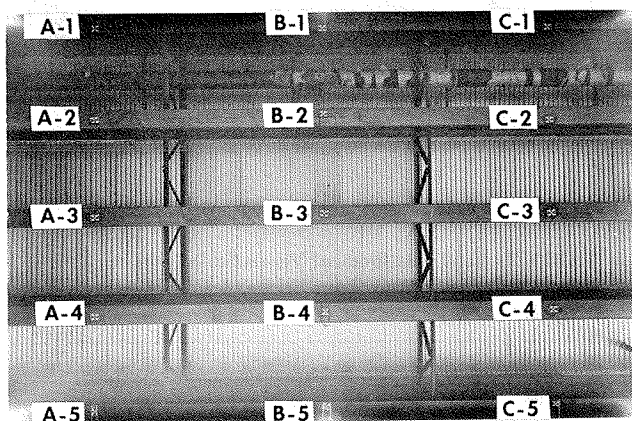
Fifth Street Bridge after pouring of concrete deck.
